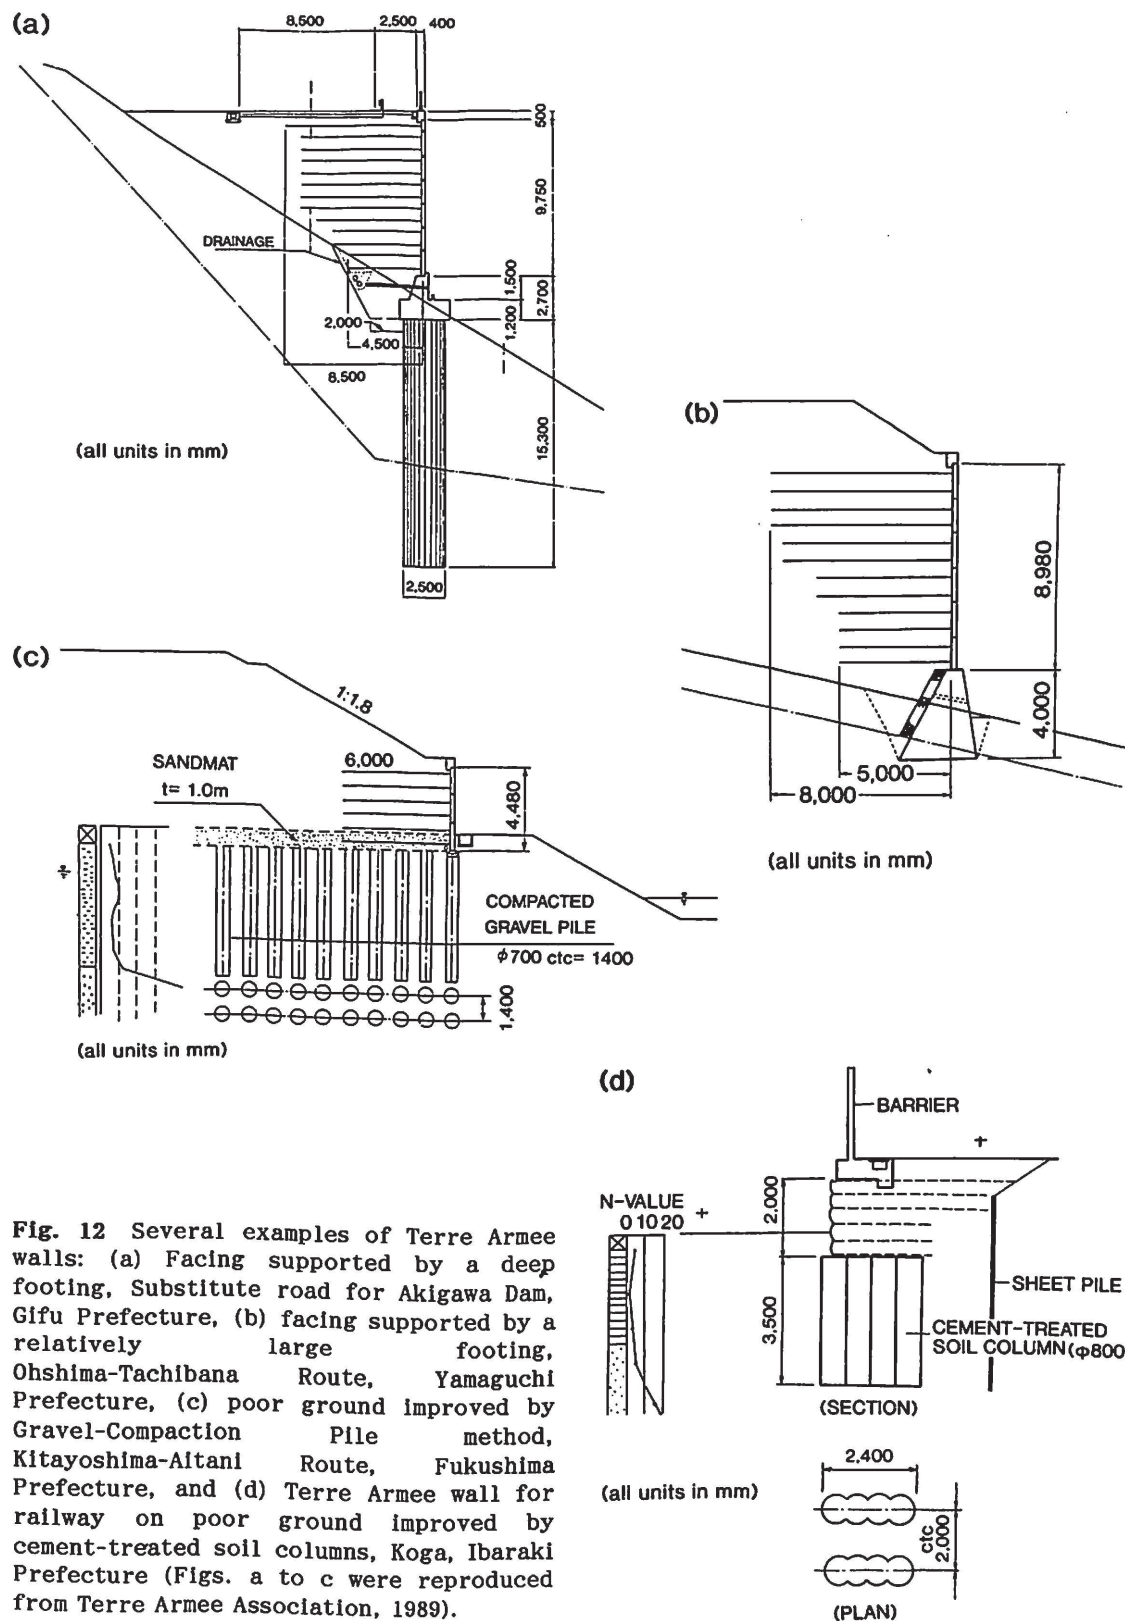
Several examples of Terre Armee walls: (a) Facing supported by a deep footing, Substitute road for Akigawa Dam, Gifu Prefecture, (b) facing supported by a relatively large footing, Ohshima-Tachibana Route, Yamaguchi Prefecture, (c) poor ground improved by Gravel-Compaction Pile method, Kitayoshima-Aitani Route, Fukushima Prefecture, and (d) Terre Armee wall for railway on poor ground improved by cement-treated soil columns, Koga, Ibaraki Prefecture (Figs. a to c were reproduced from Terre Armee Association, 1989).
